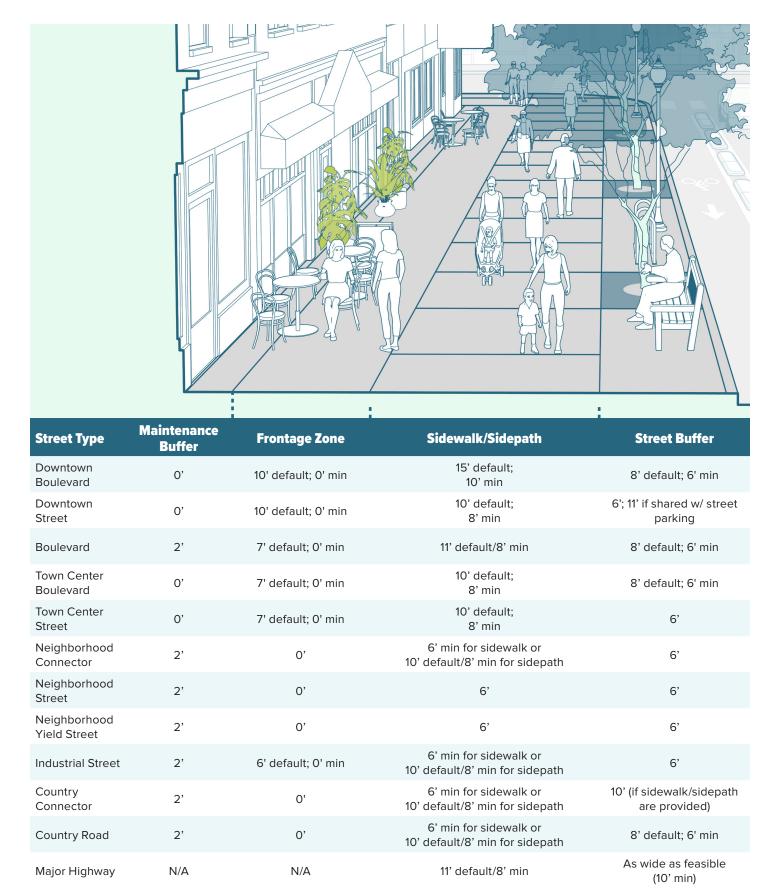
Sidewalk dimensions (If a separated bike lane is present, a Ped / Bike Buffer is also required. See Chapter 2.) For street buffers on open section roads, see Section 3.8.
